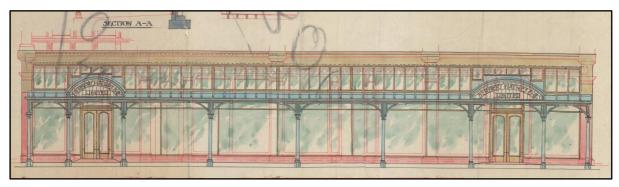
Detail from 1923 plans showing the alterations to the street frontage of Hebert Haynes's building (Wilson, 1923b).
